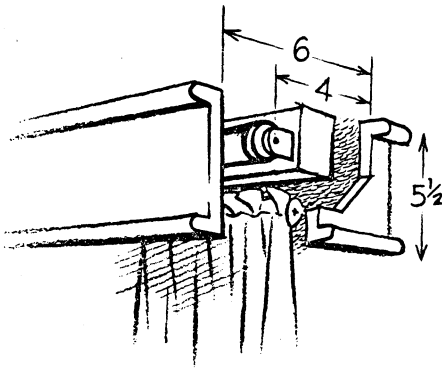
Here are details of a wall valance. Install lighting tubes at least 4 inches out from wall. Place tubes near top of the valance so you cannot see them as you sit or stand in the room.
